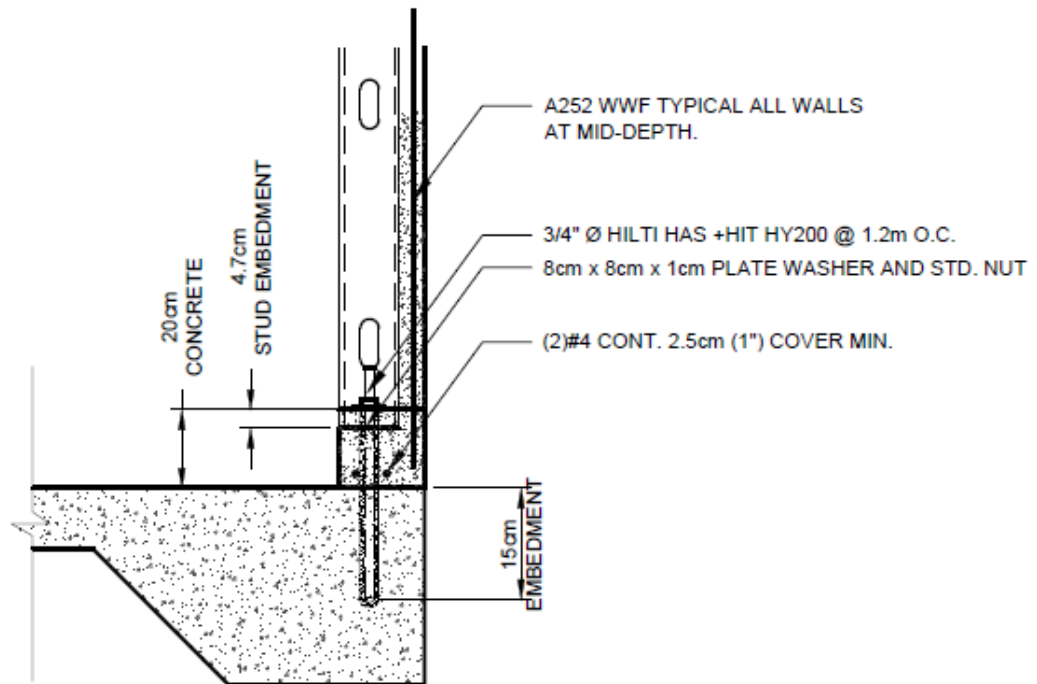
Typical connection for the wall panel (Tuck, 2014)
